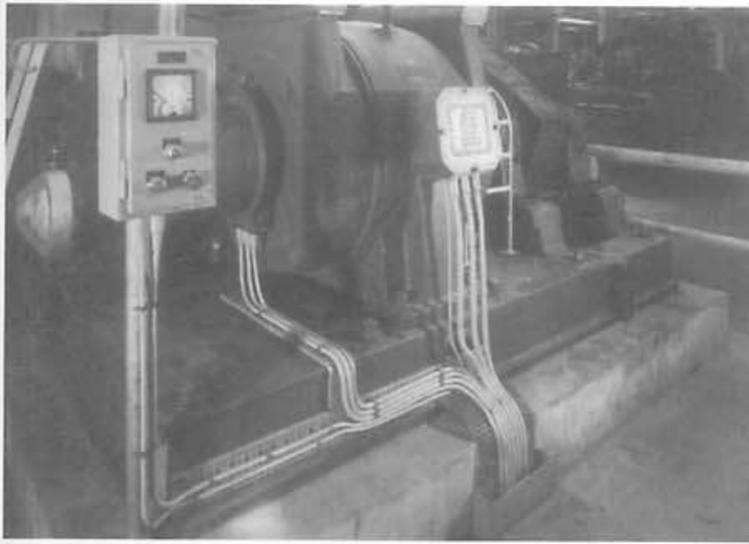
(b) Wiring to a motor MM CABLES PYROTENAX
